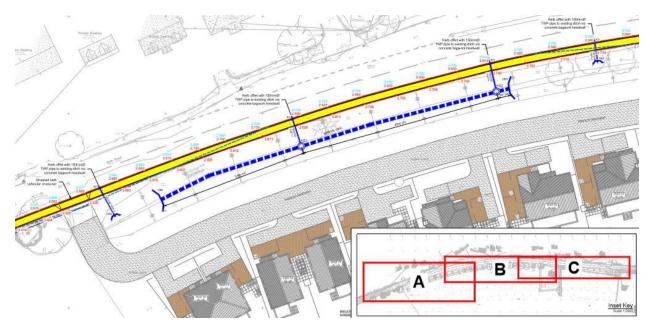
Extract from plans provided by the applicant, showing the location of the proposed 76m culvert in blue, the proposed carriageway over the existing culvert in Grey, and the proposed footpath highlighted yellow.
